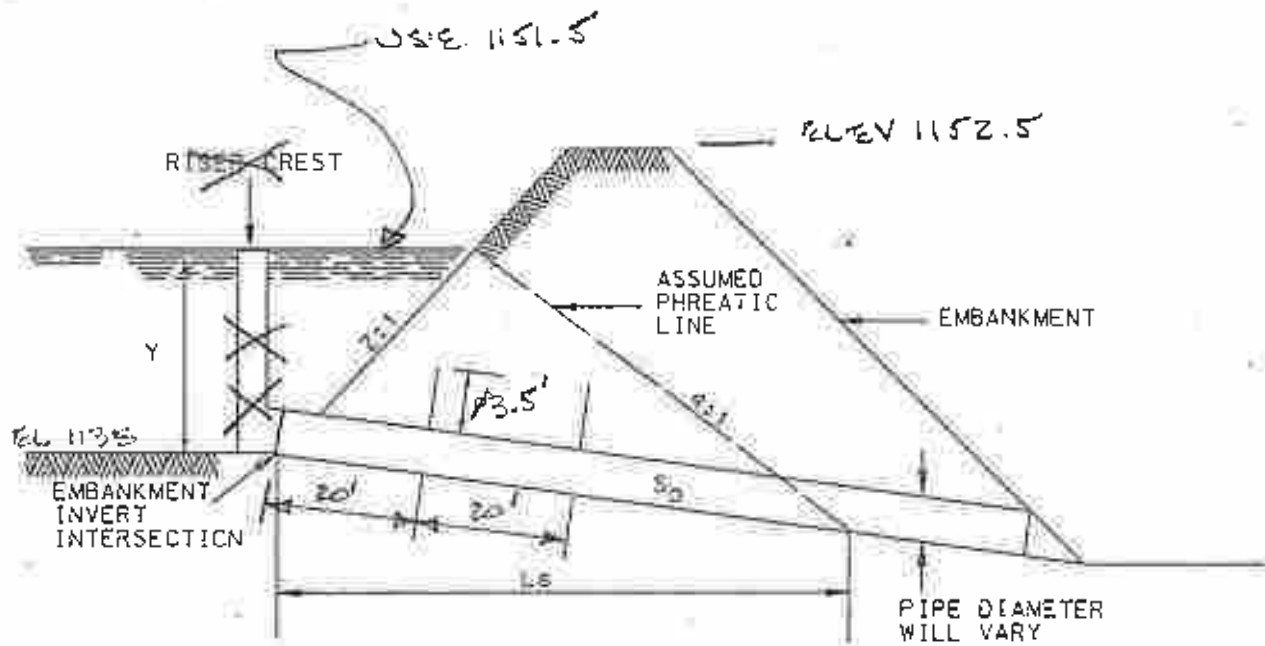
TYPICAL ANTI-SEEP COLLARS
